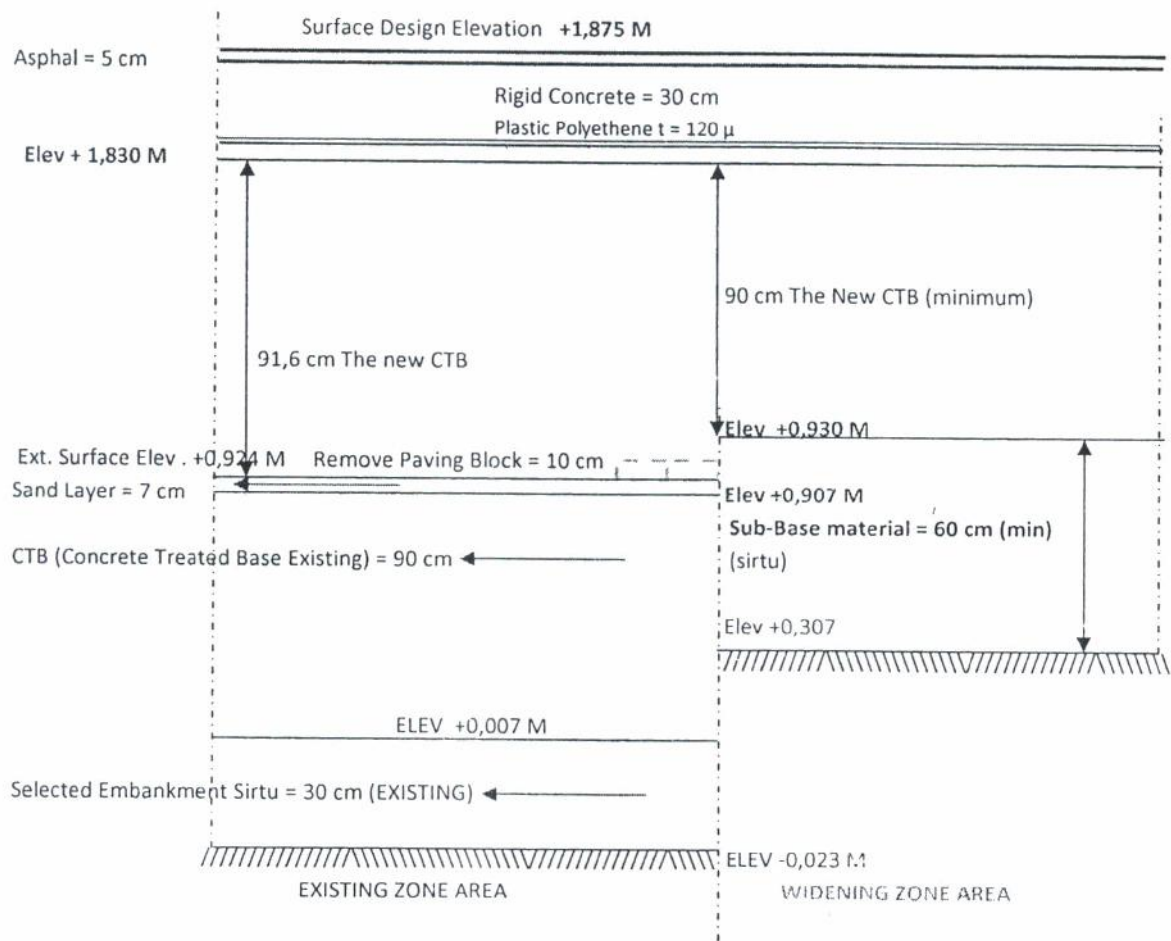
The Proposed Road Construction in STA 7+820 JICT
